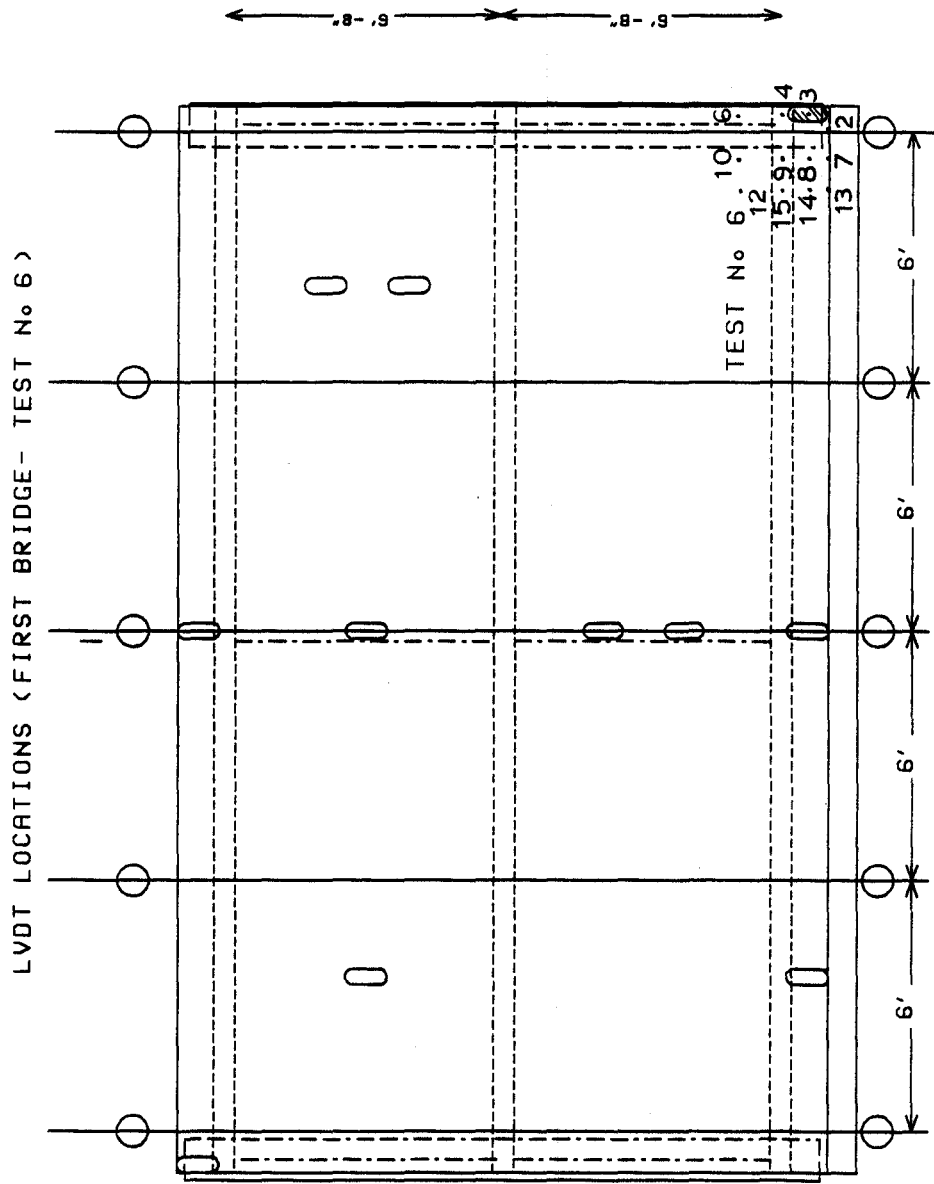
LVDT Locations (First Bridge - Test No. 6)
